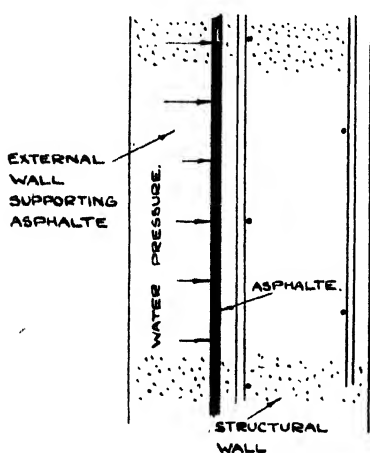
PROVISION OF EXTERNAL SUPPORTING WALL FOR ASPHALTE
